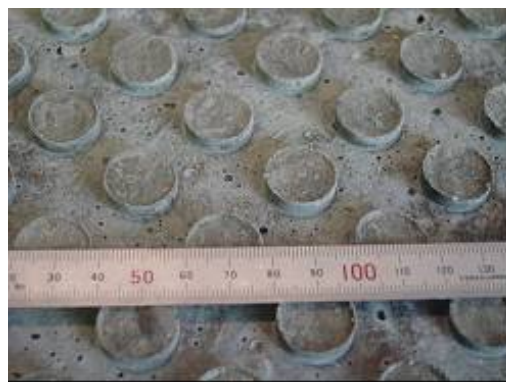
Pavement Sections of HSC-WT in the Second Loading Test.
